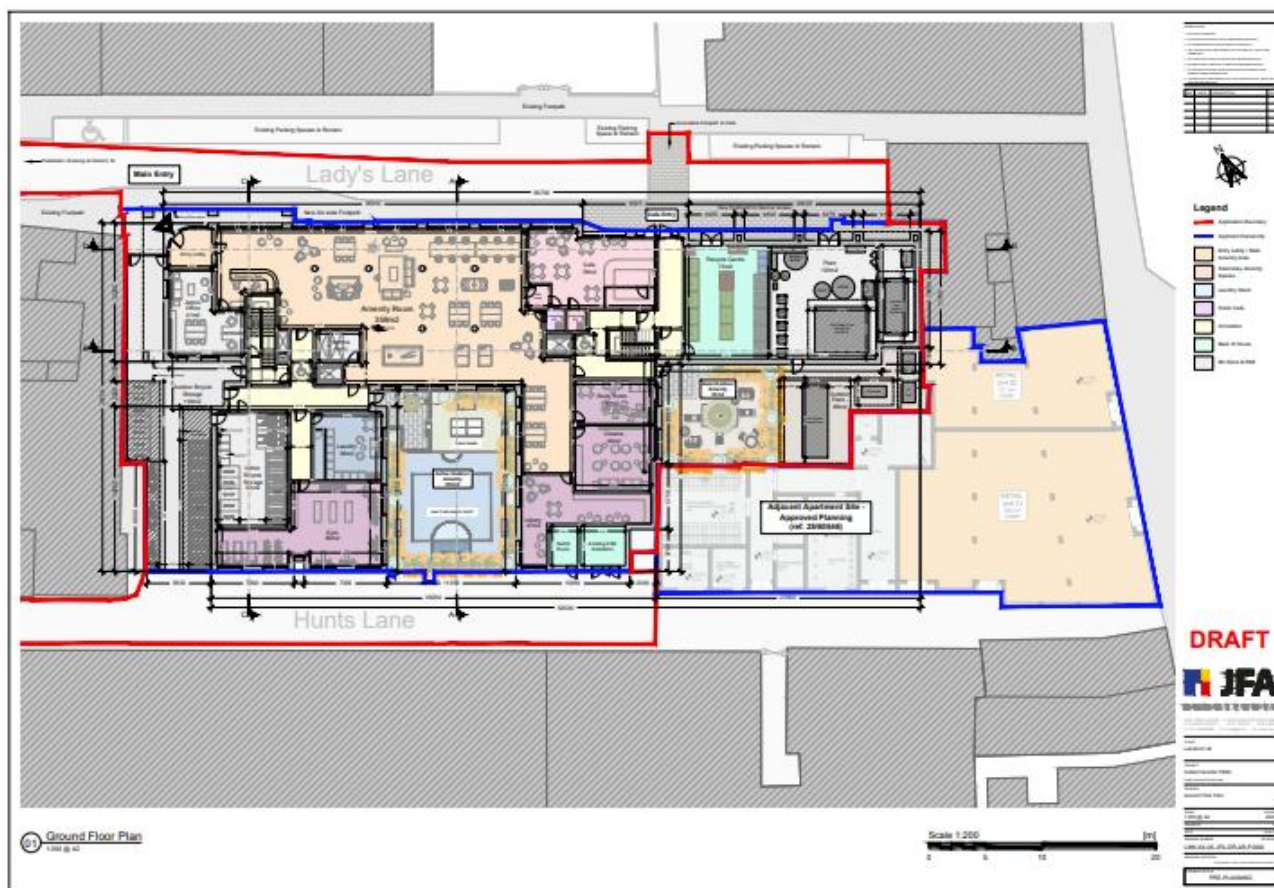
PROPOSED SITE LAYOUT (JFA, 2026).
